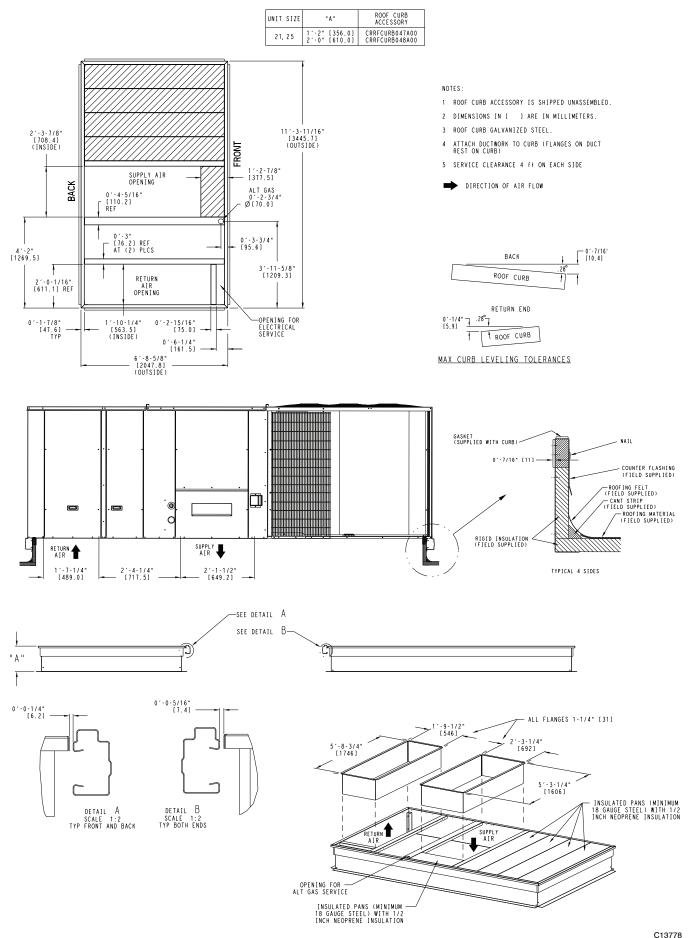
Roof Curb Details - 21 and 25 Size Units
